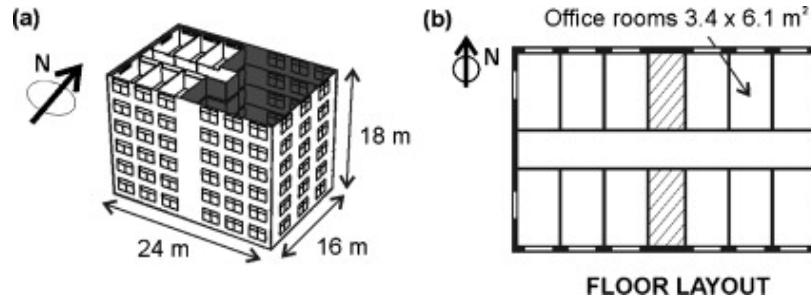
Building geometry (a) and plan of a typical floor layout (b) (in white the occupied zones)
